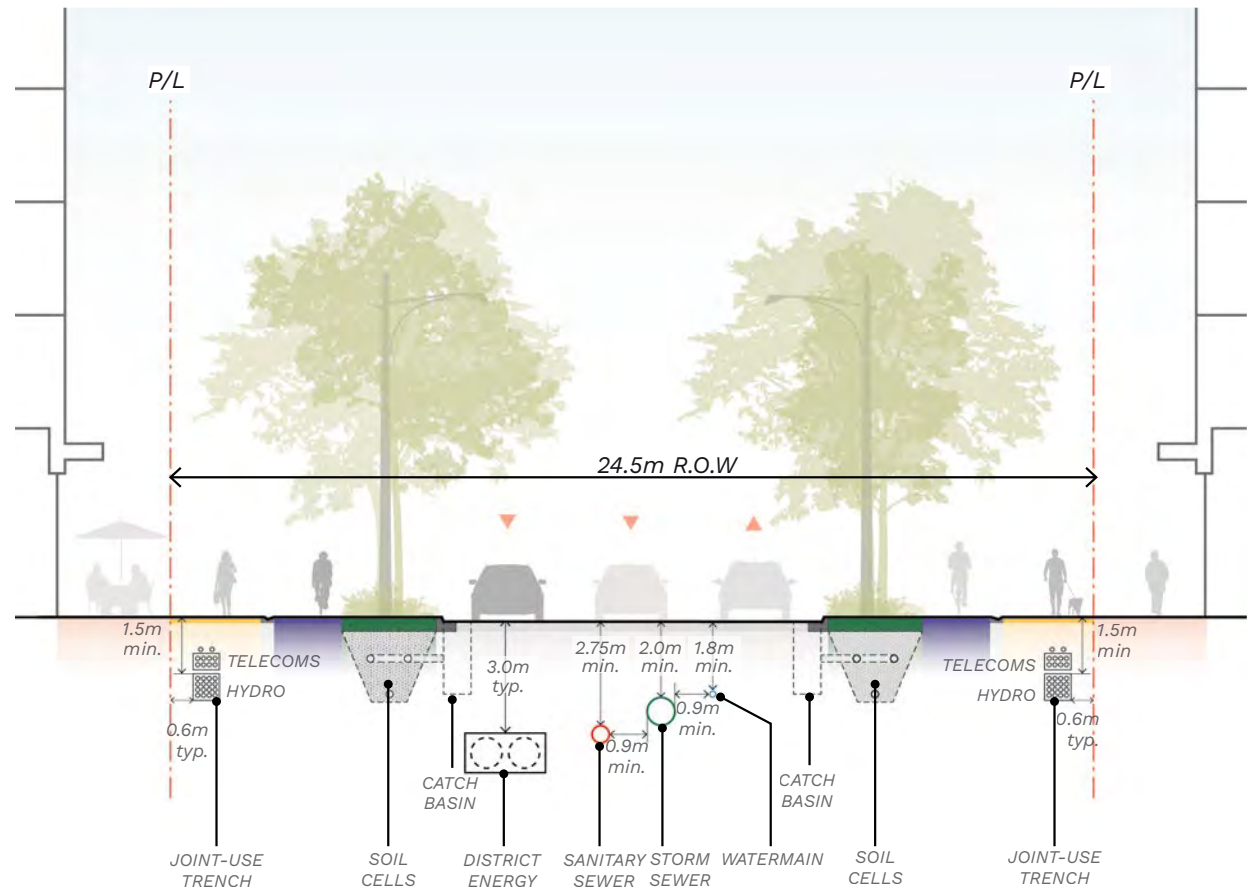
Conceptual 24.5 metre right-of-way showing potential underground infrastructure.
